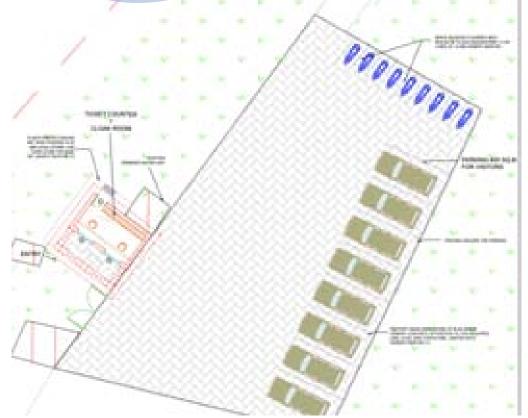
Concept of parking and ticket counter at A on the above plan
